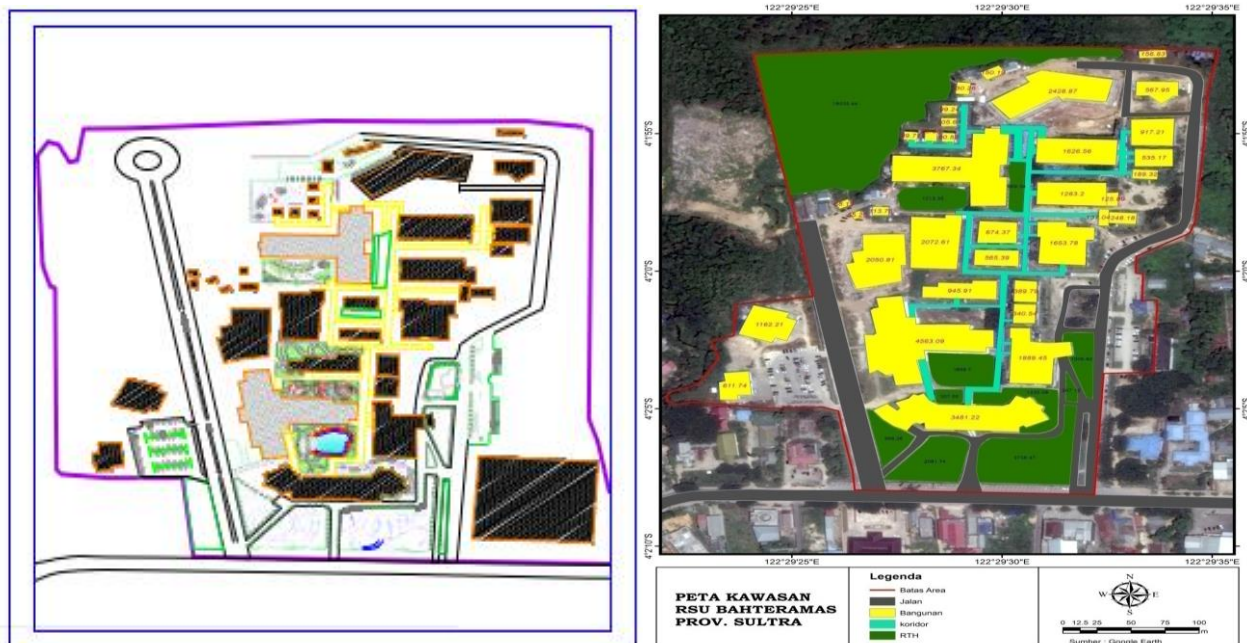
Site Plan (Left) and Surface Plan (Right) green open space At Bahteramas Hospital,
